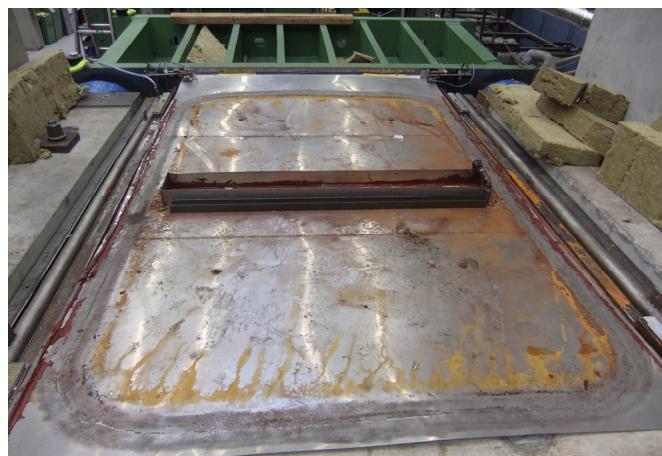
Steel sheet sealing all but the centre crack with notch around the crack
